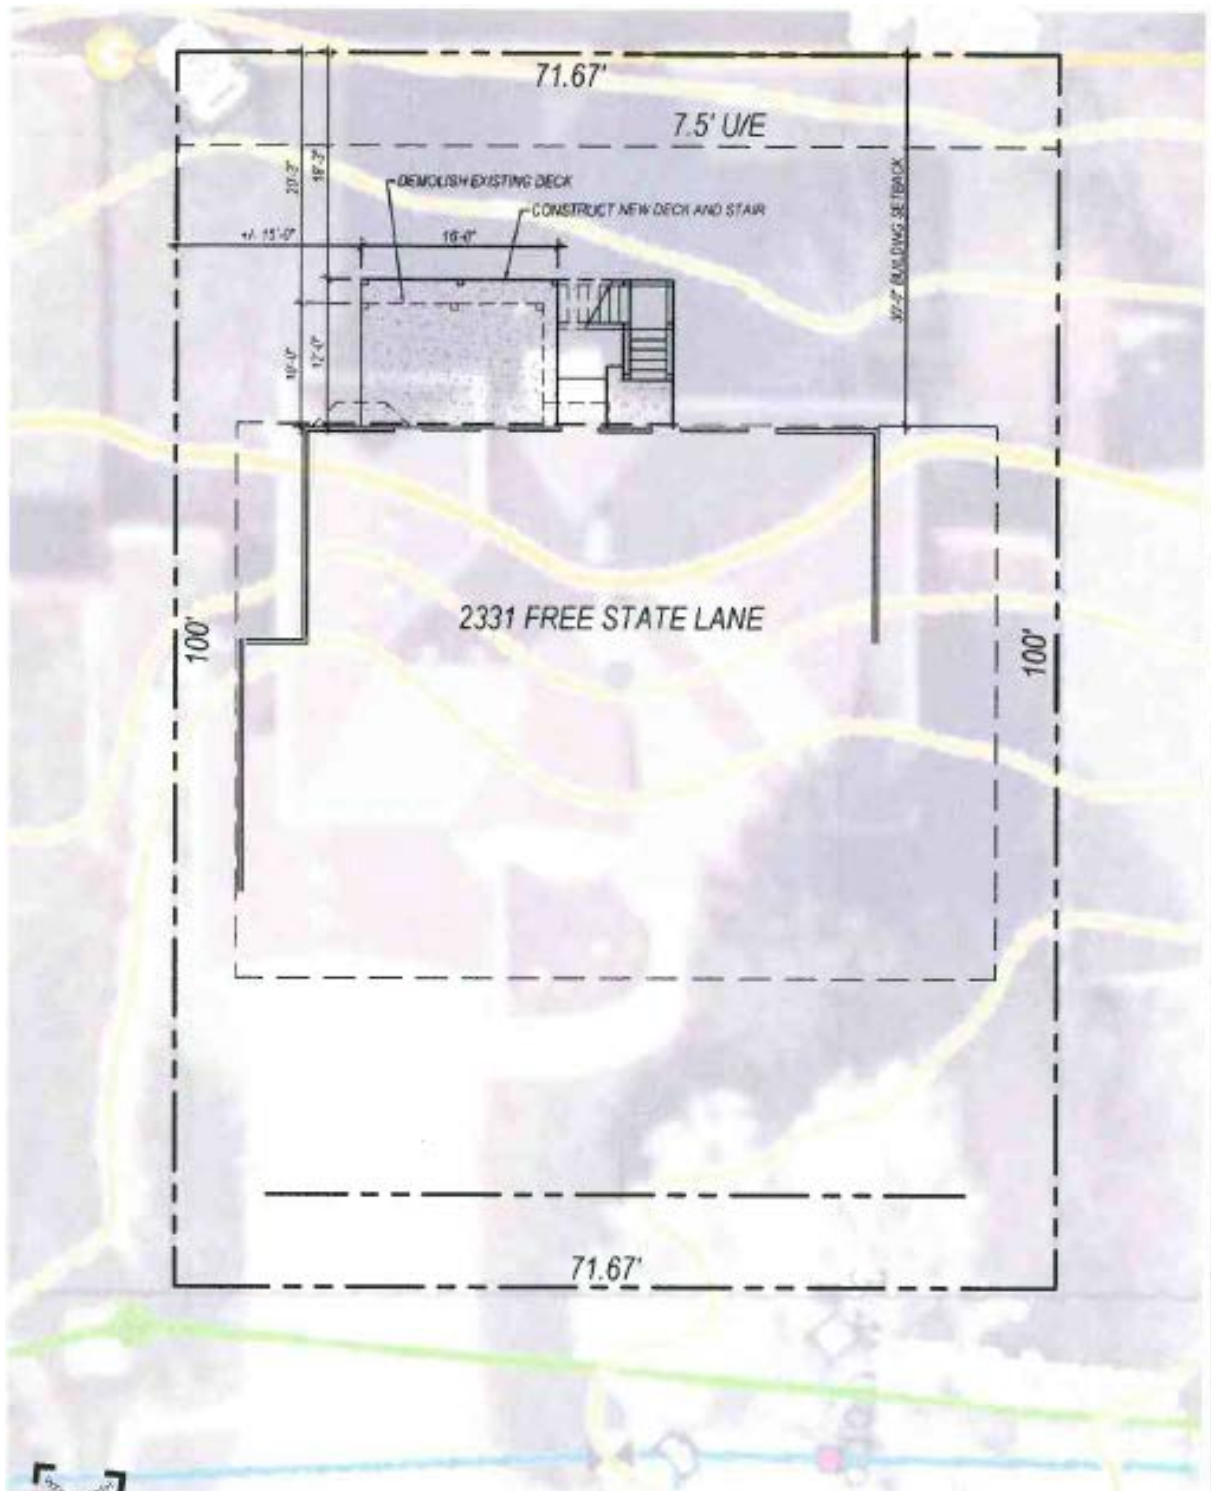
Applicant's site plan of Proposed Addition (deck) and existing residence. Proposed deck will extend an additional two feet into the rear yard.
